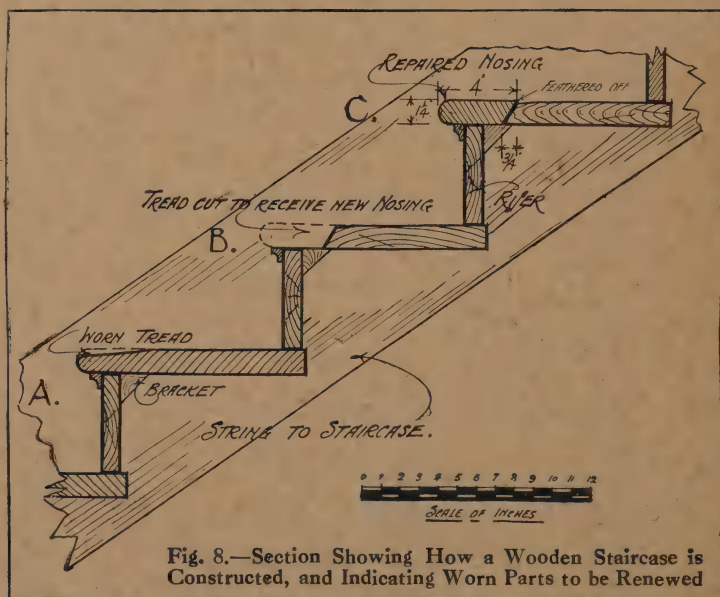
Section Showing How a Wooden Staircase is Constructed, and Indicating Worn Parts to be Renewed
